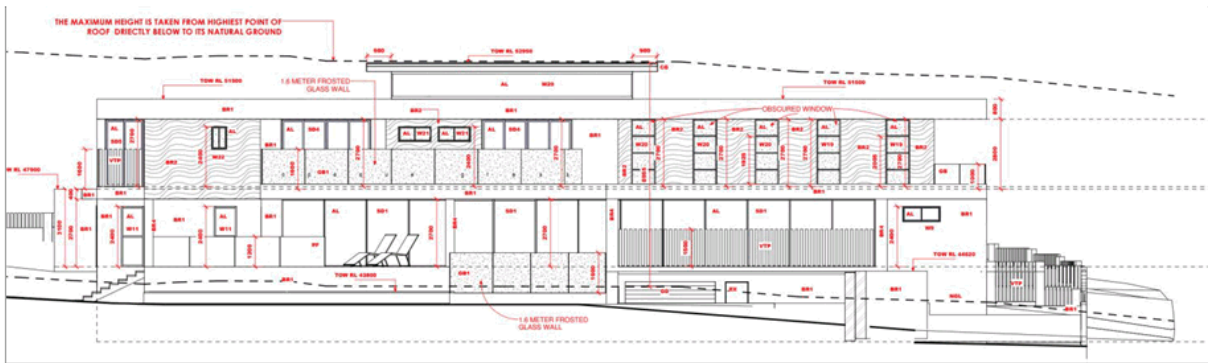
Two Storey Dwelling House with Basement, located at No. 32 Strathalbyn Drive (Approx. 100m to the East of the subject site). DA/650/2021, approved 19 March 2024.
